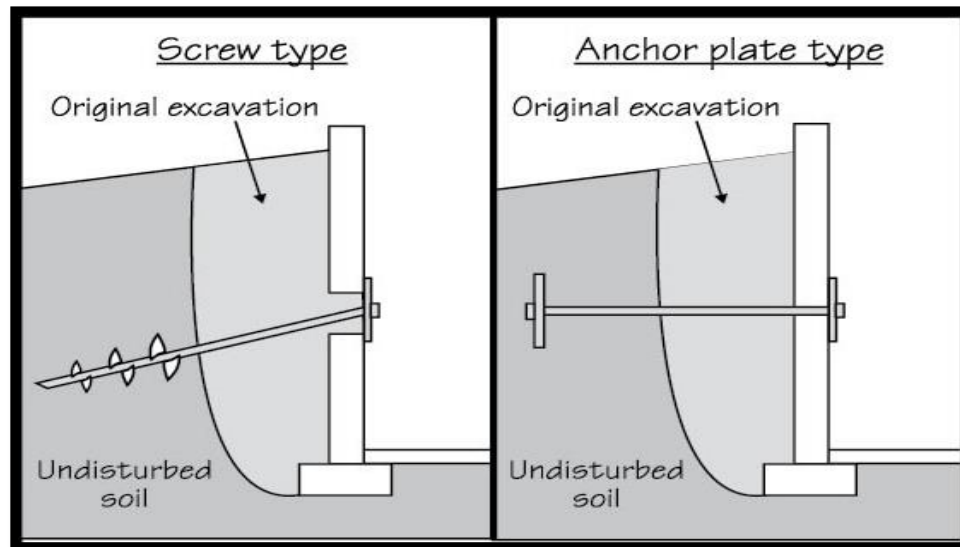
Anchored retaining walls. (<http://www.soundhomeinspections.com/>)
